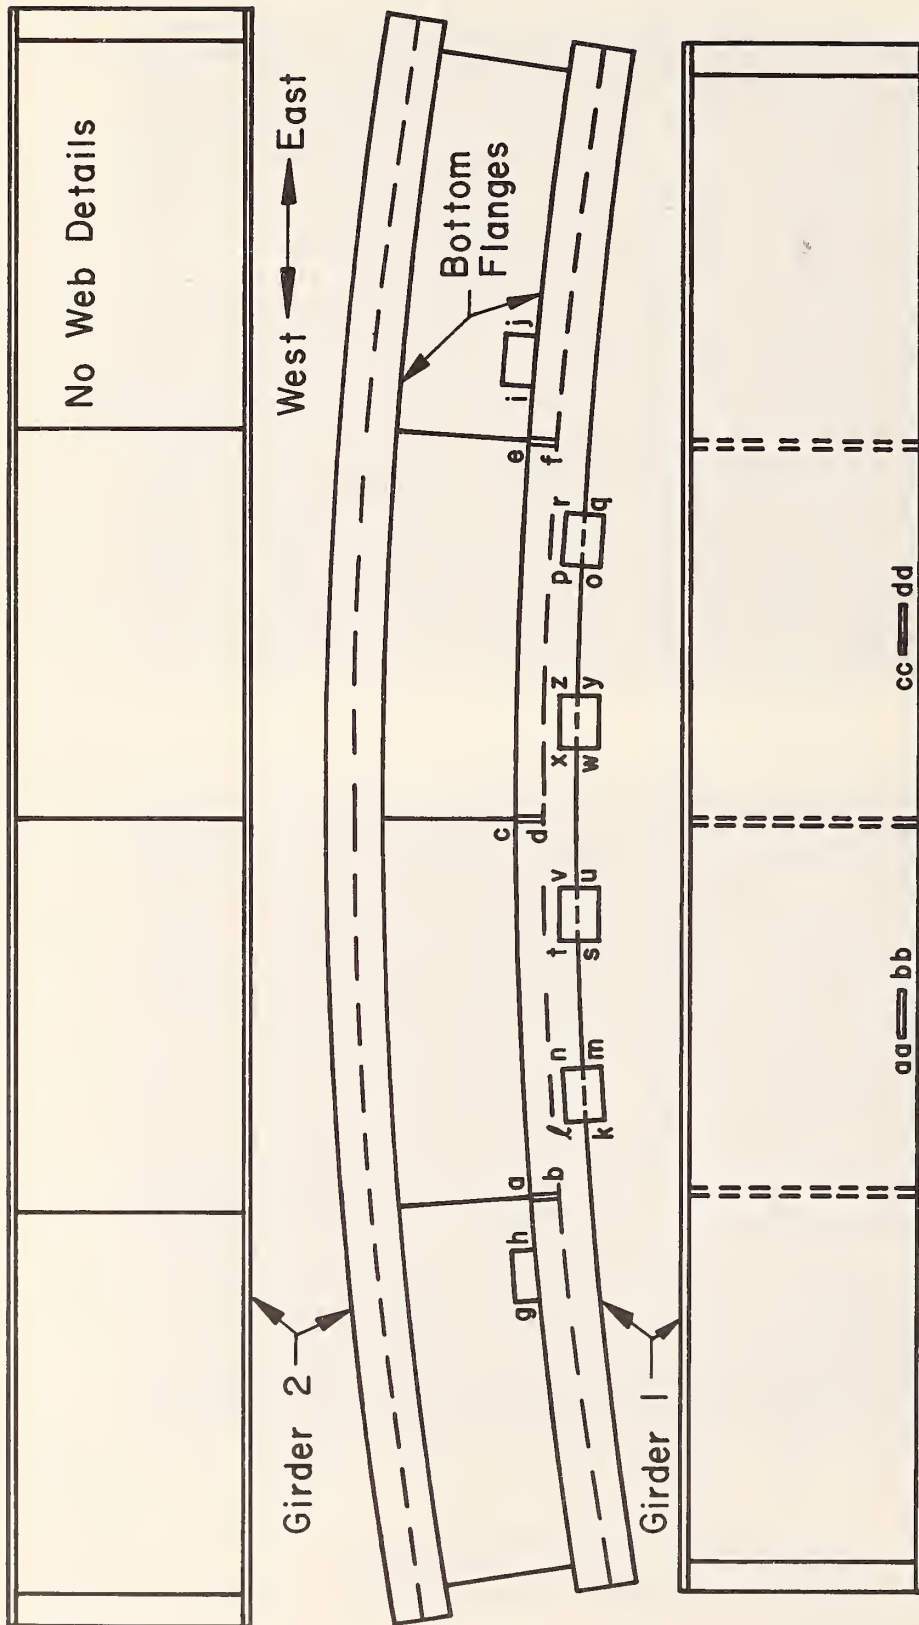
Group 1 and Group 2 welded Details on Assembly 1
